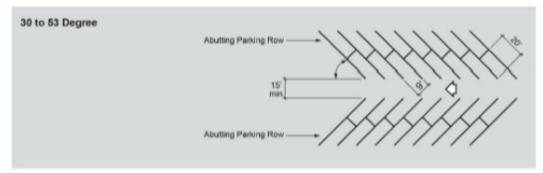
U.1 Off-street Parking Requirements, Parking Layouts
